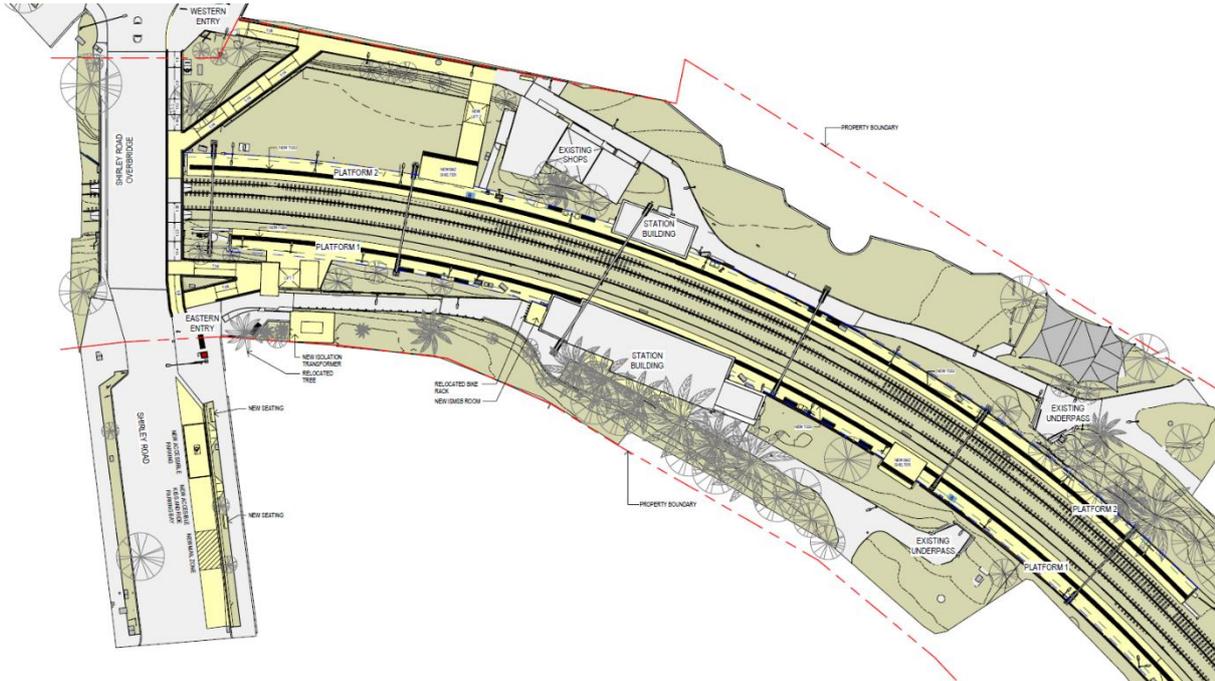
Architectural site plan—proposed works. (Source: Jacobs for Transport for NSW)
